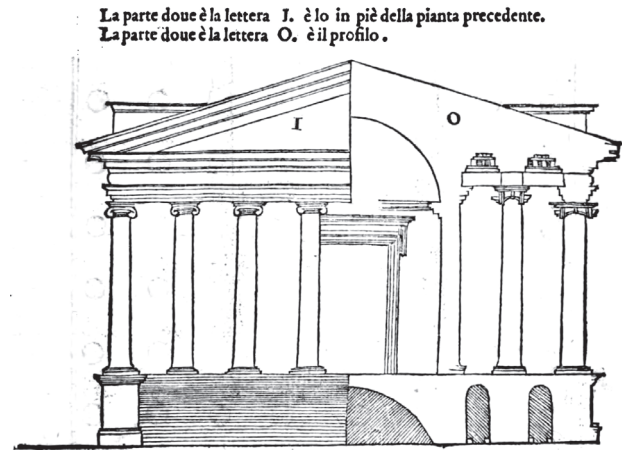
Elevation and section of a temple. Barbaro 1567, p. 32.
